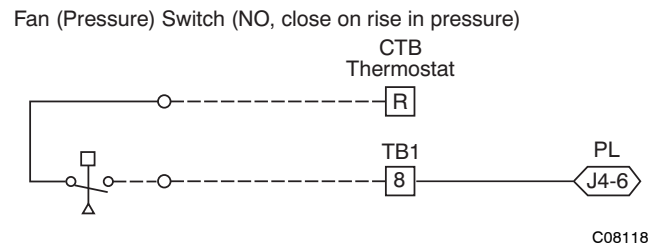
PremierLink Controller Wiring Fan Pressure Switch Connection C08118
